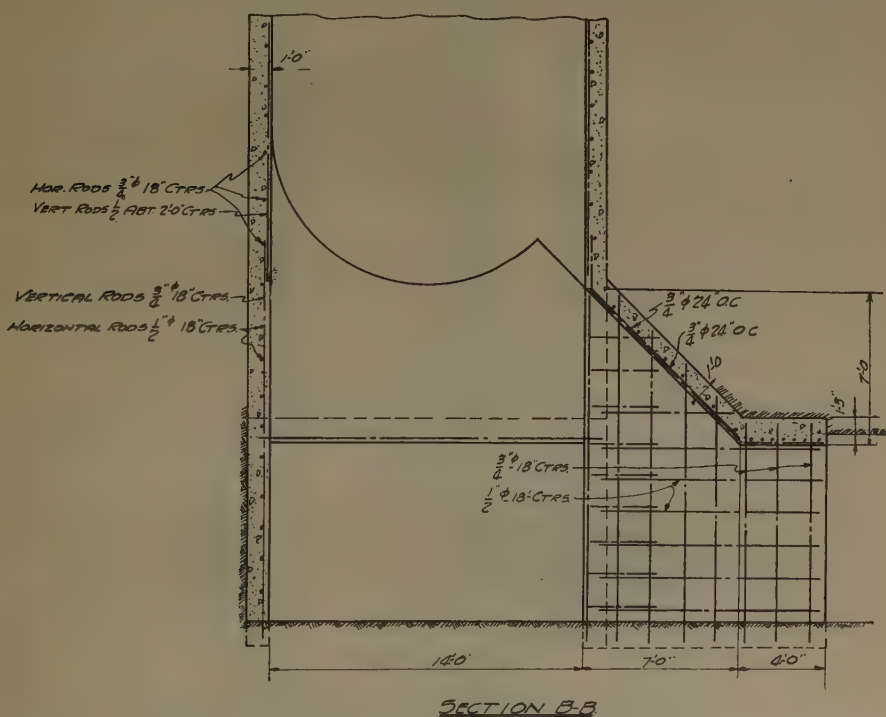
SECTION B-B, NEW AIR SHAFT, NEW ORIENT MINE.
